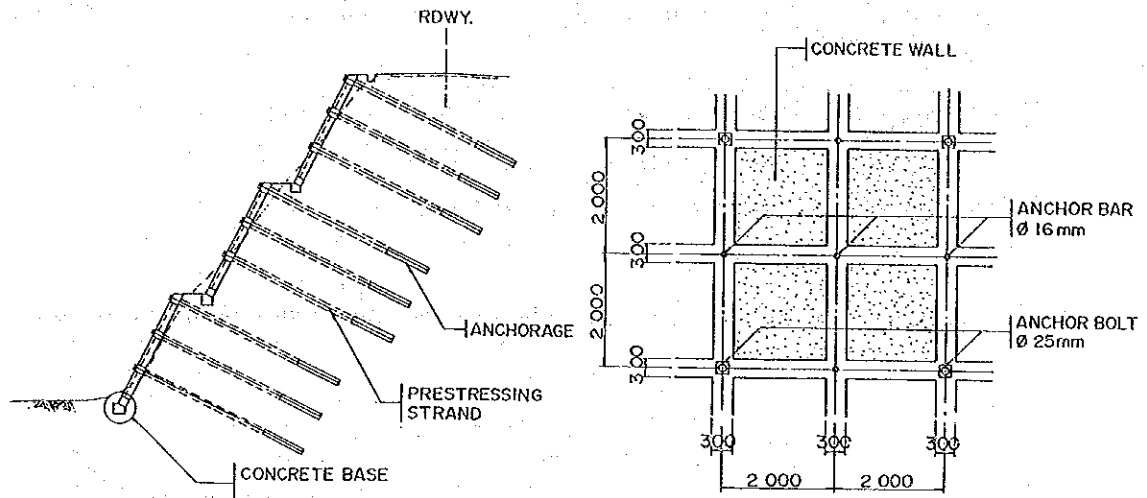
CAST-IN-PLACE CONCRETE CRIB
